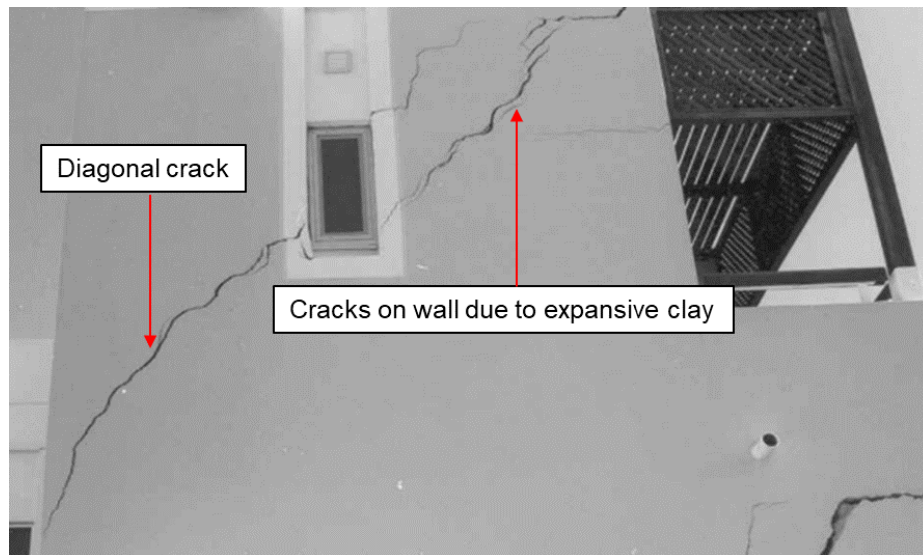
Structural damage due to foundation failure (After Al-Rawas, 2006)
